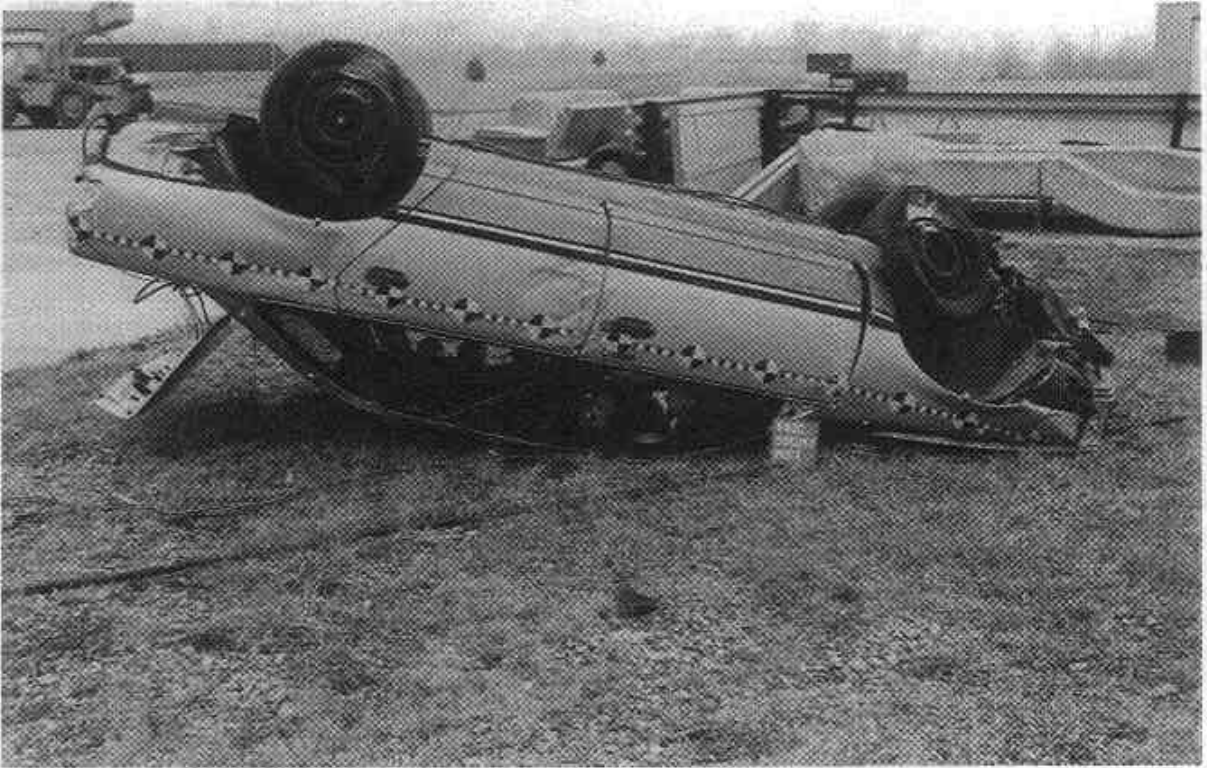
POST-TEST RIGHT SIDE - VIEW 1
